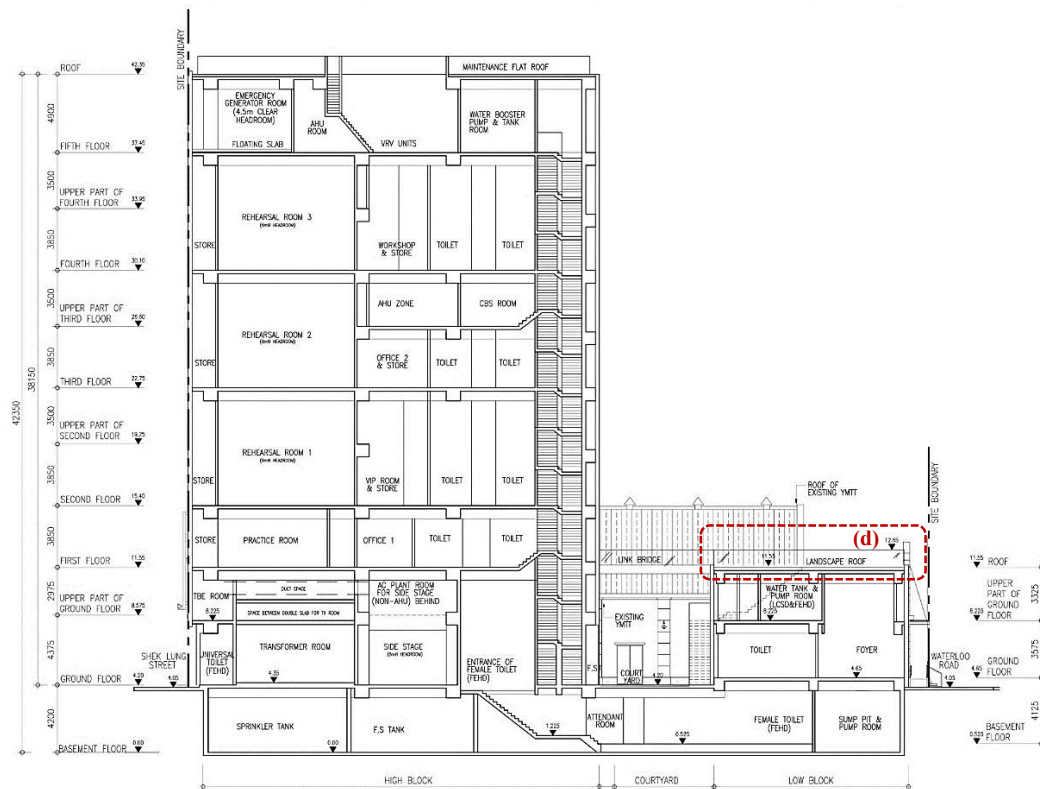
Figure III. Proposed Section C-C - (d) the building height of the proposed low block is lowered by approximately 0.7m for better appreciation of the pitched roof and roof feature of YMTT.
